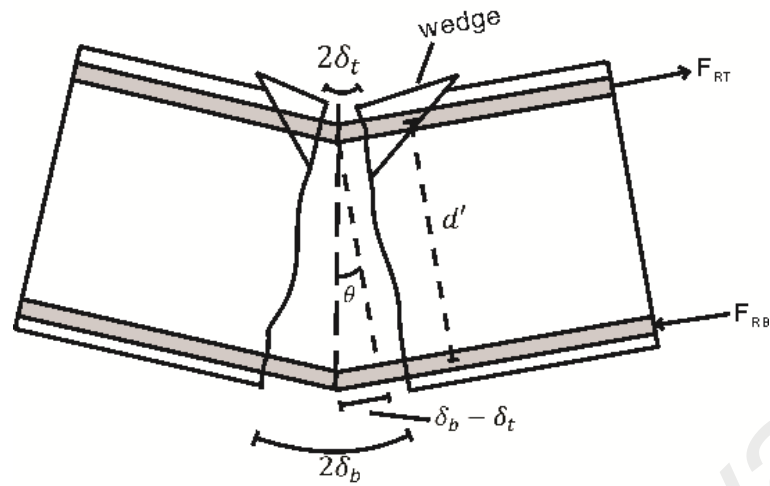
Full-Depth Crack on Beam Segment.
